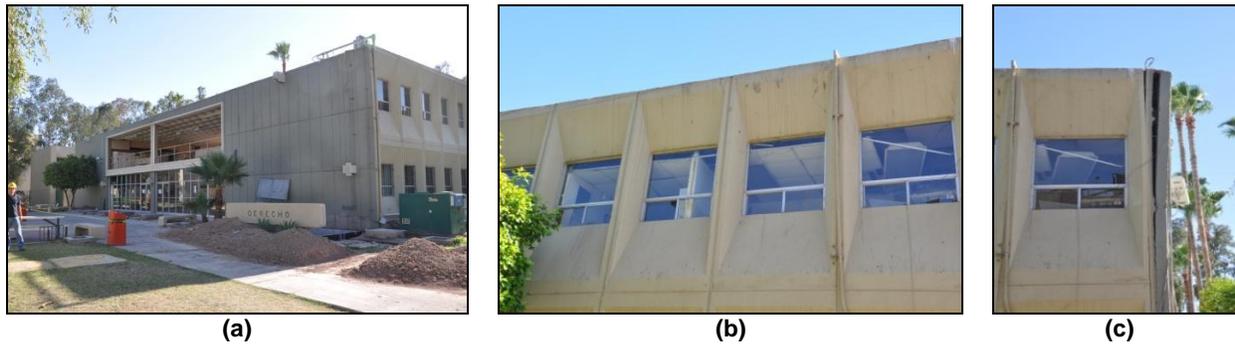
Office buildings at the Mexicali campus of UABC: (a) west building (looking east); (b) out-of-plane failures of the reinforced CMU in the west building; (c) east building (full building height infill) (32.6330°N, 115.4439°W) (Building E in Figure 3.9).
